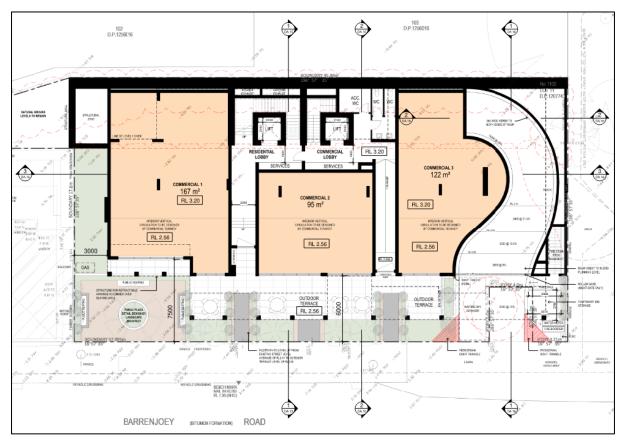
Proposed Ground Floor Plan (Innovate Architects, 2024)
